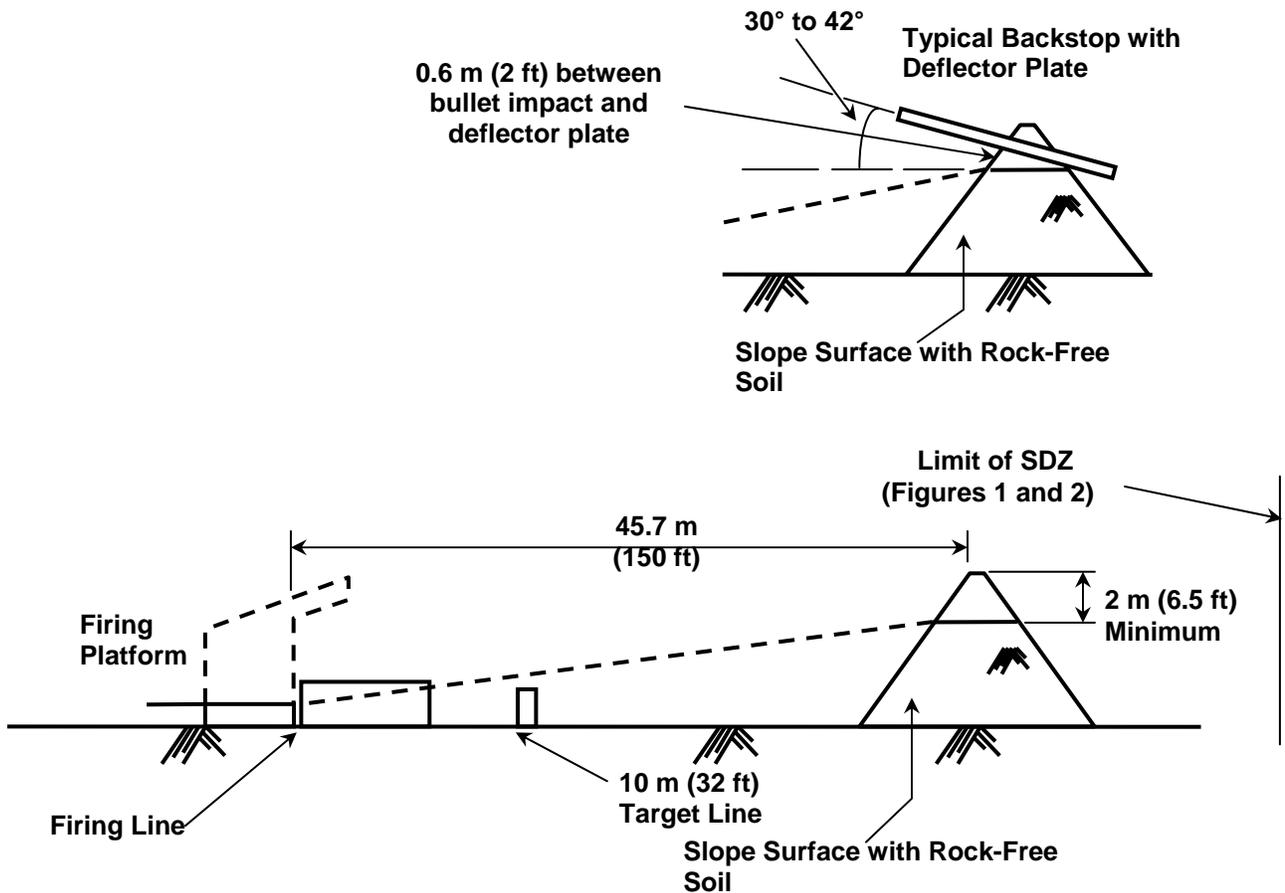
Machine Gun, 10-Meter Tube Range Typical Cross-Section
